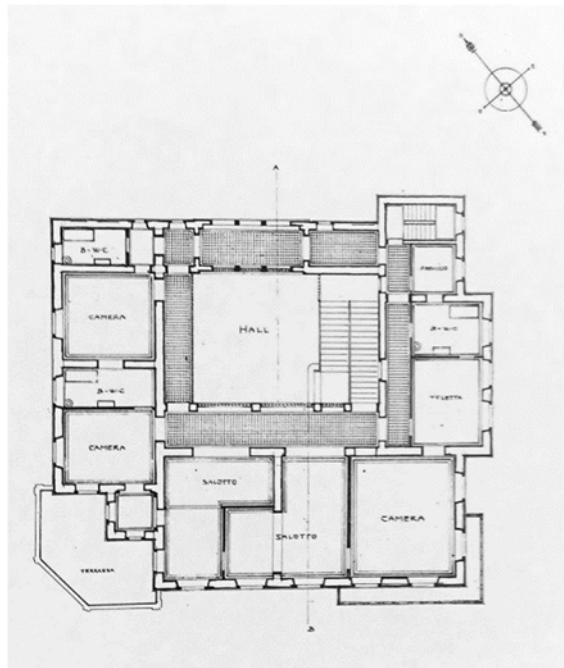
E. Basile. Villa Deliella, plan of the first floor. 1905
